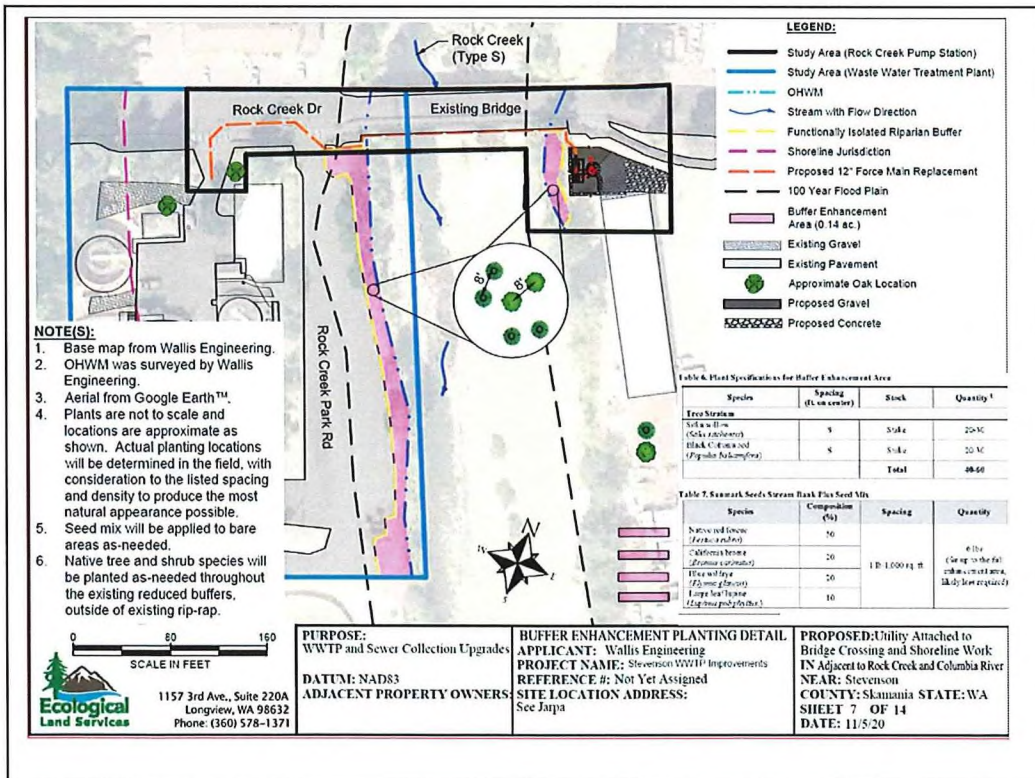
Rock Creek and WWTP Approved Landscape Plan
